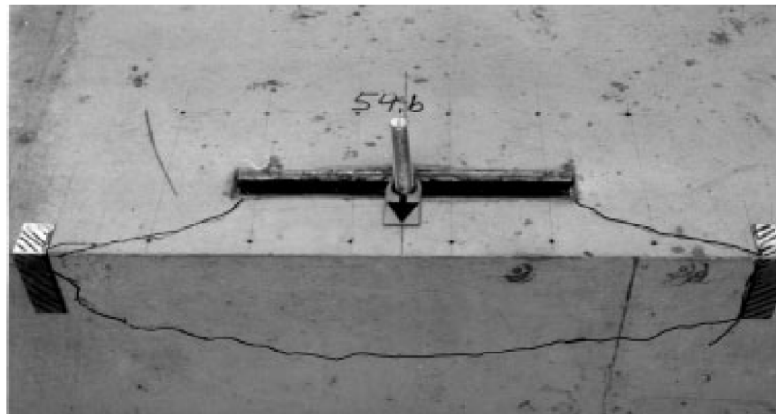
Photo of anchor channel after test, concrete edge failure. Shear load applied between anchors. [8]
